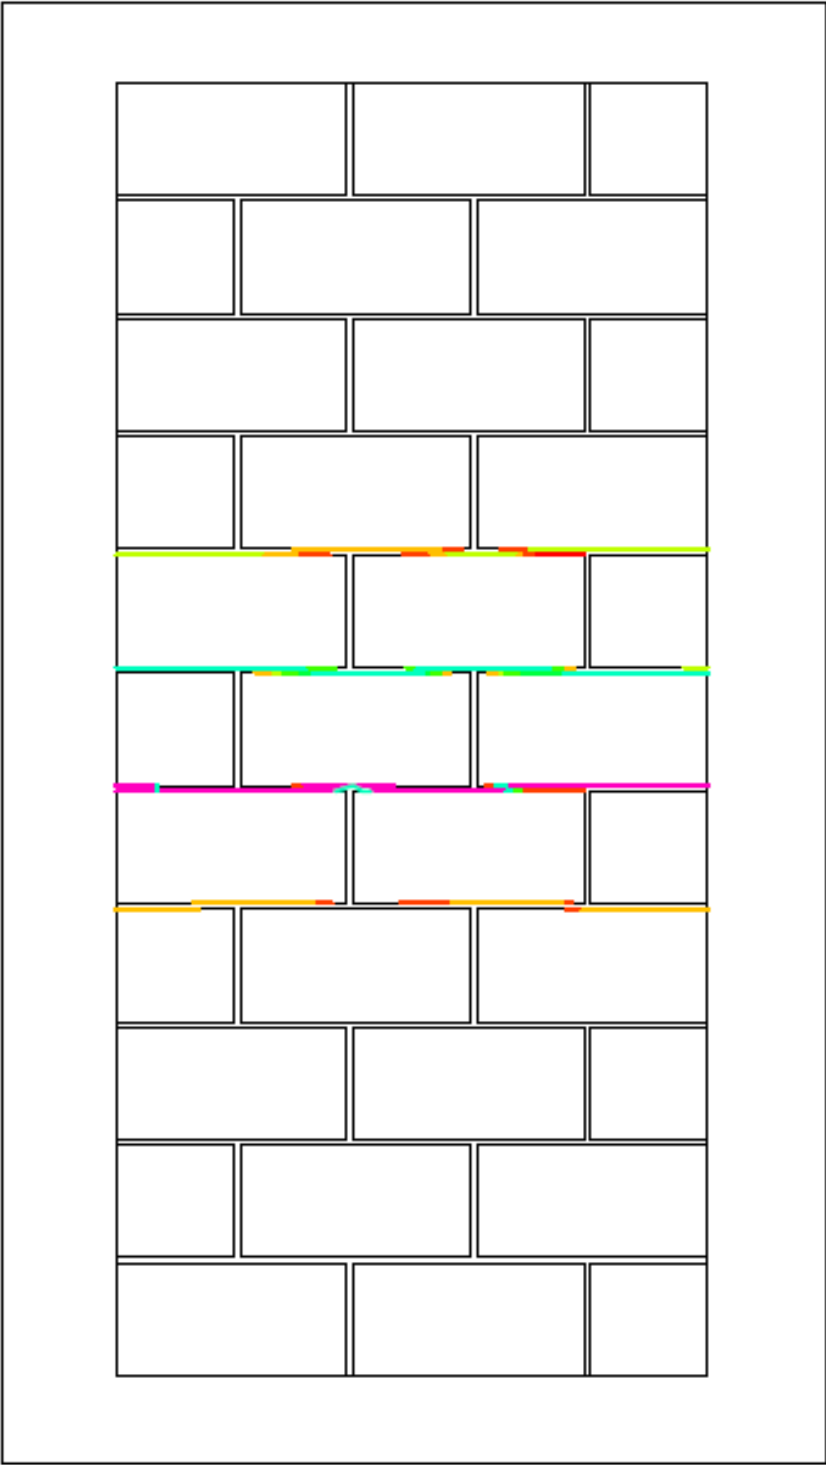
Cracking Pattern of B-2 2.2m Wall
